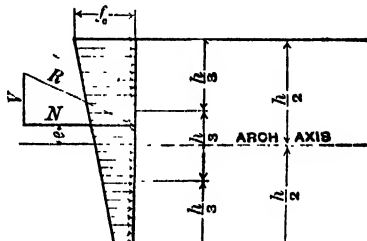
Stresses Caused by a Force Within the Middle Third of Plain Concrete Section. (See p. 561.)
